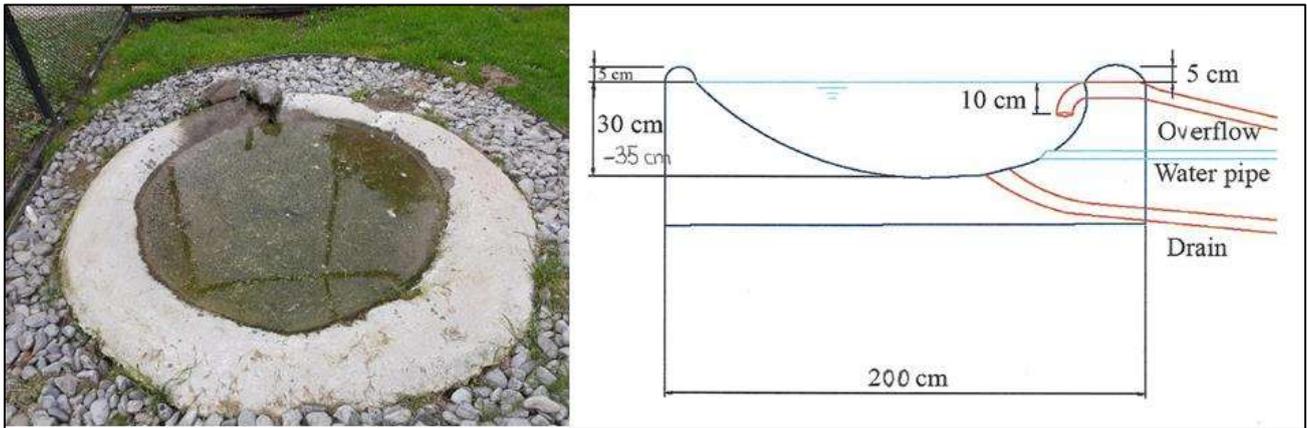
Drawing taken from Bearded Vulture Housing Guidelines, VCF and adapted for cinereous vultures.
